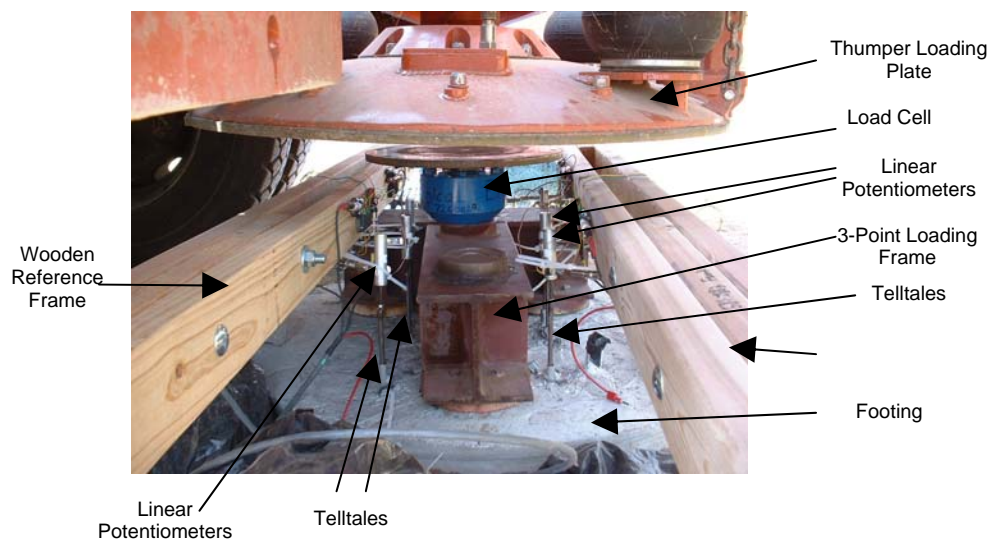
Arrangement of the Footing Instrumentation and Loading System
